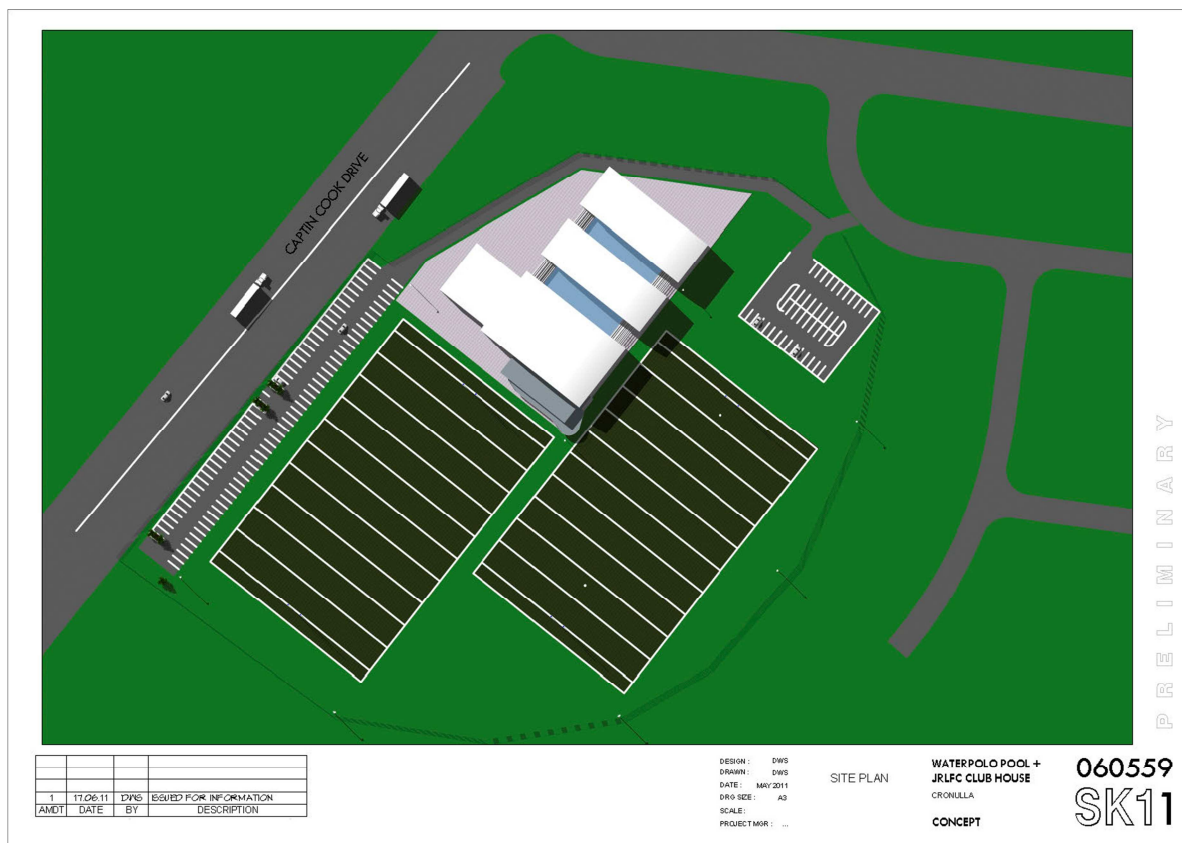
Proposed Cronulla High School Facilities – Preliminary Plan
